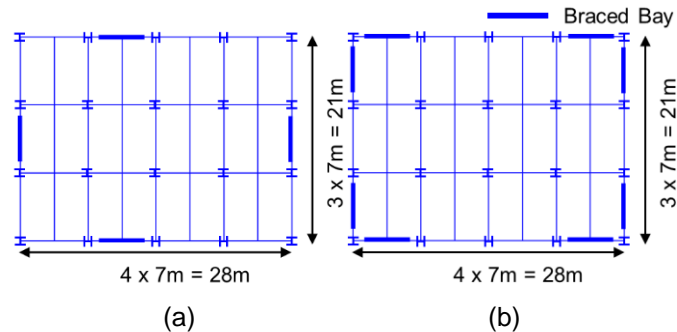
Plan of office buildings (a) 4S (b) All other buildings
